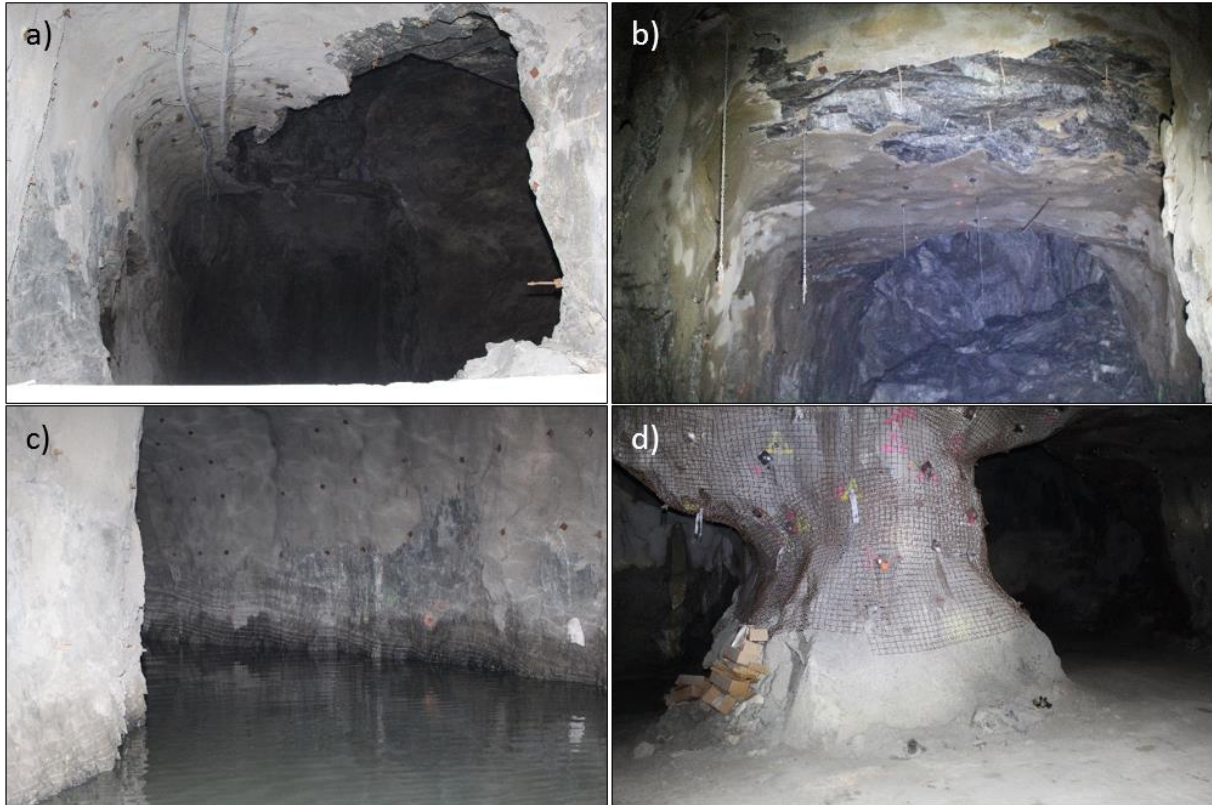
Observed damage in Lappberget orebody. (a) Failure at the stope opening in Stope 5 level 602. (b) Shotcrete and rock damage in Stope 15 level 926. (c) Flooding in a drift due to water leakage through fractures. (d) Pillar deformation in the footwall drift of level 896. (photos: Mozaffari, 2016)
